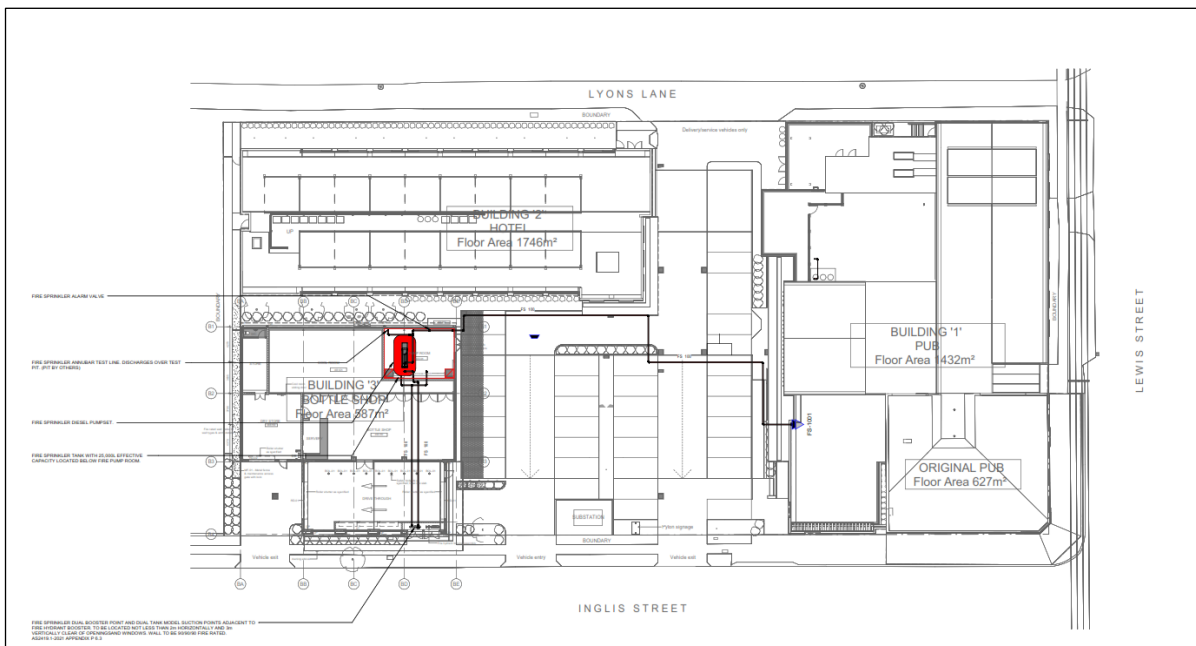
New Fire Sprinkler System – Site Plan, Bergstrom Architects
